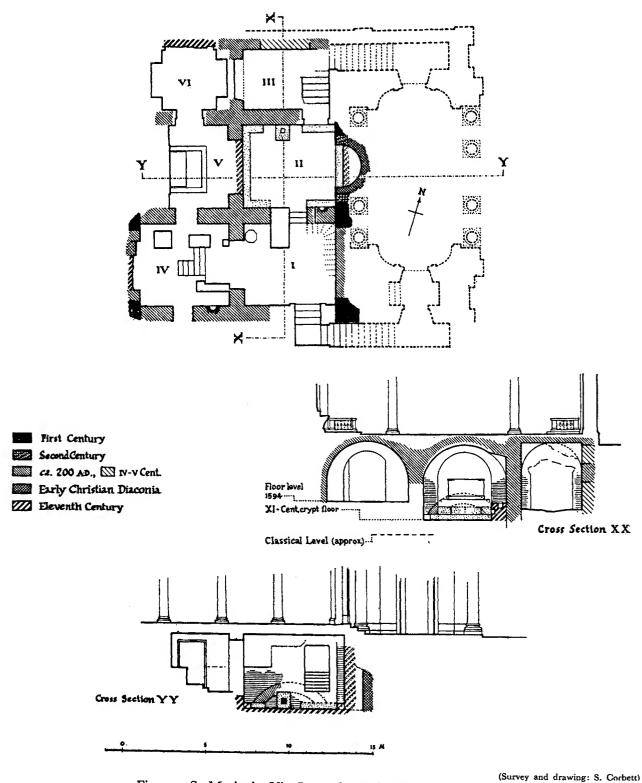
S. Maria in Via Lata, Ground plan and sections
